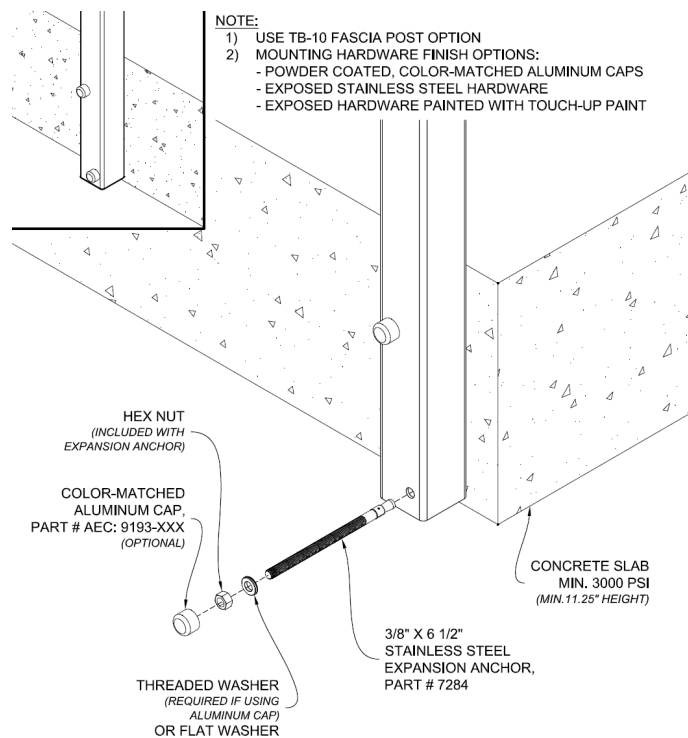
Fascia Mount to Concrete (2-3/8" Heavy Duty Post Only)
